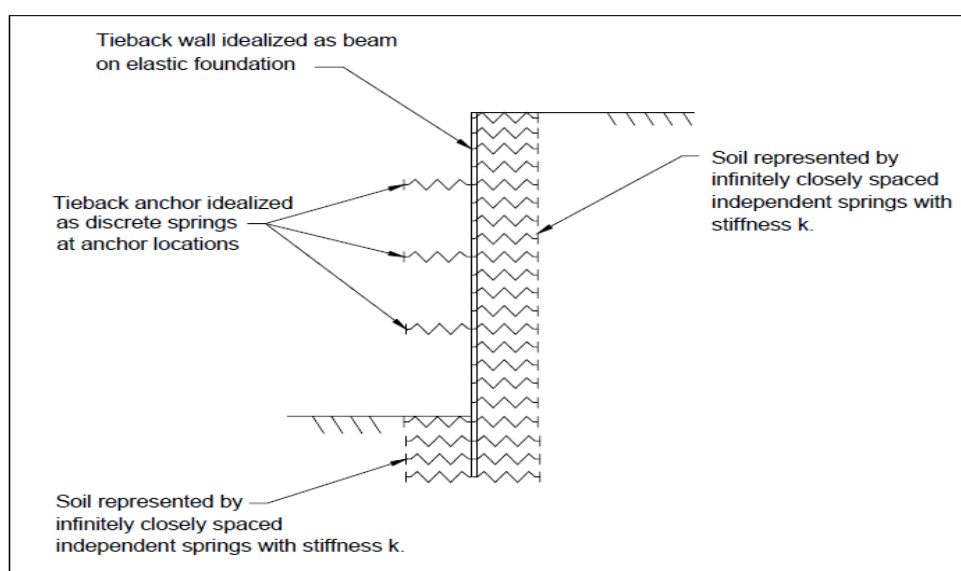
Beam on elastic foundation method (WINKLER)
